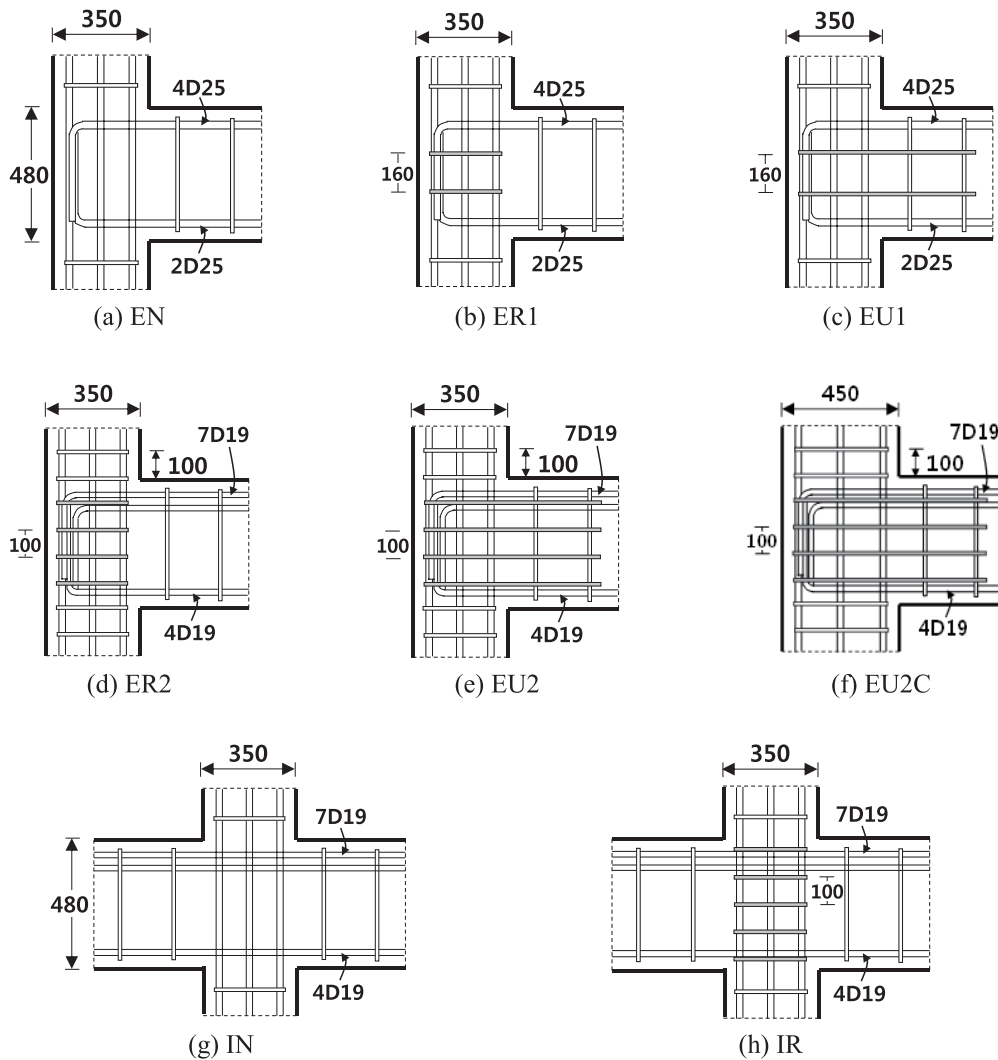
Details of longitudinal and transverse reinforcement of beam-column joints
